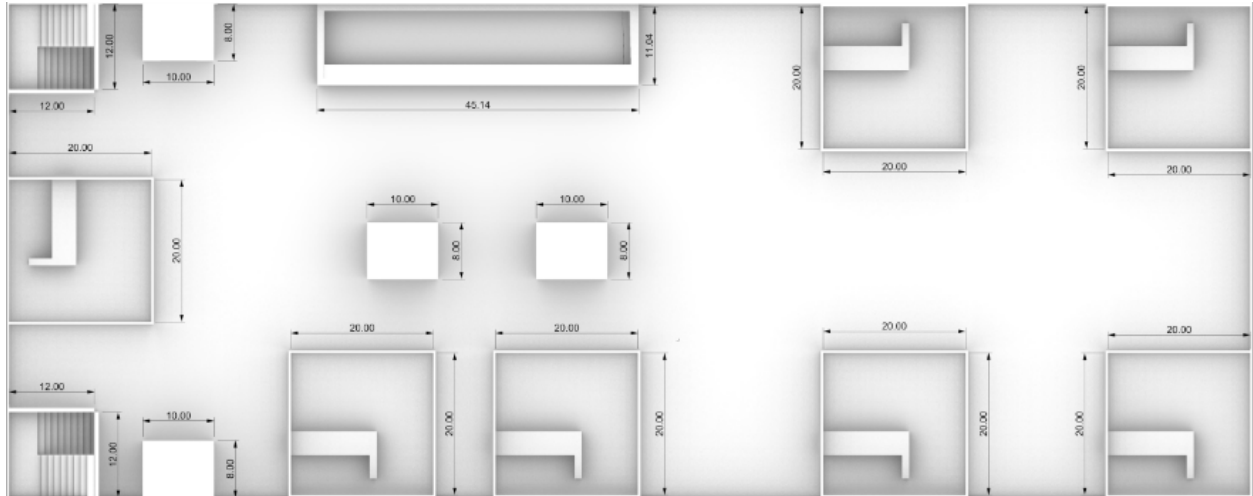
Rendered floor plan of Floor 6, showing dimensions of advising offices and reception desk.
